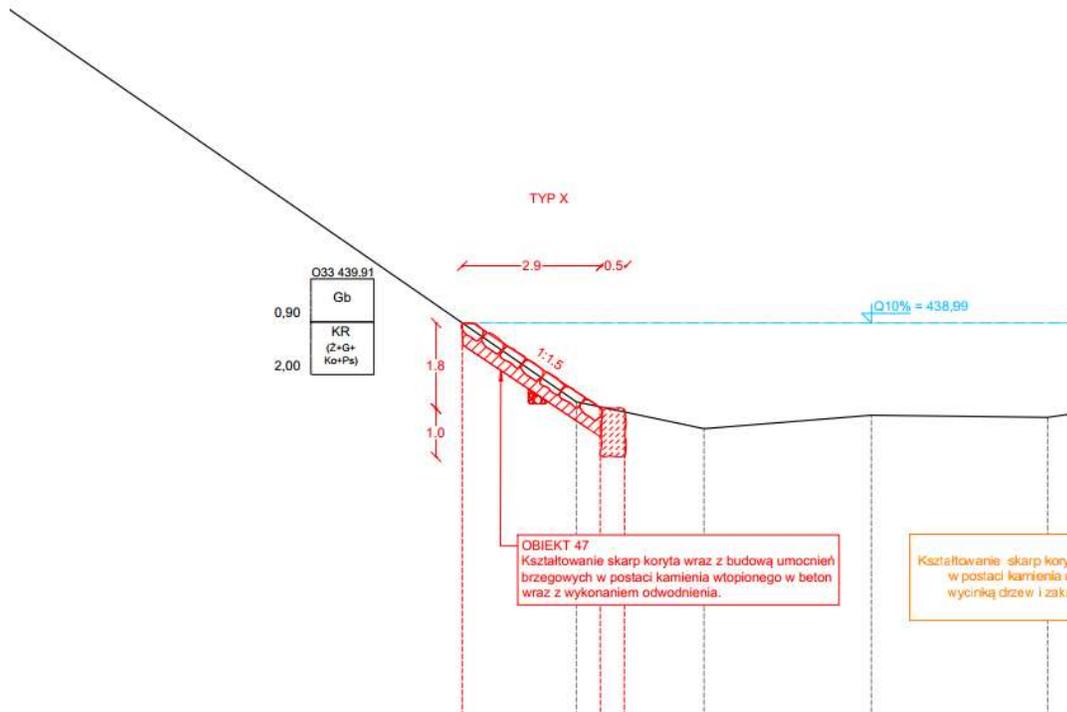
A part of the cross-section - the right river bank at km 25+065 – 25+150.
